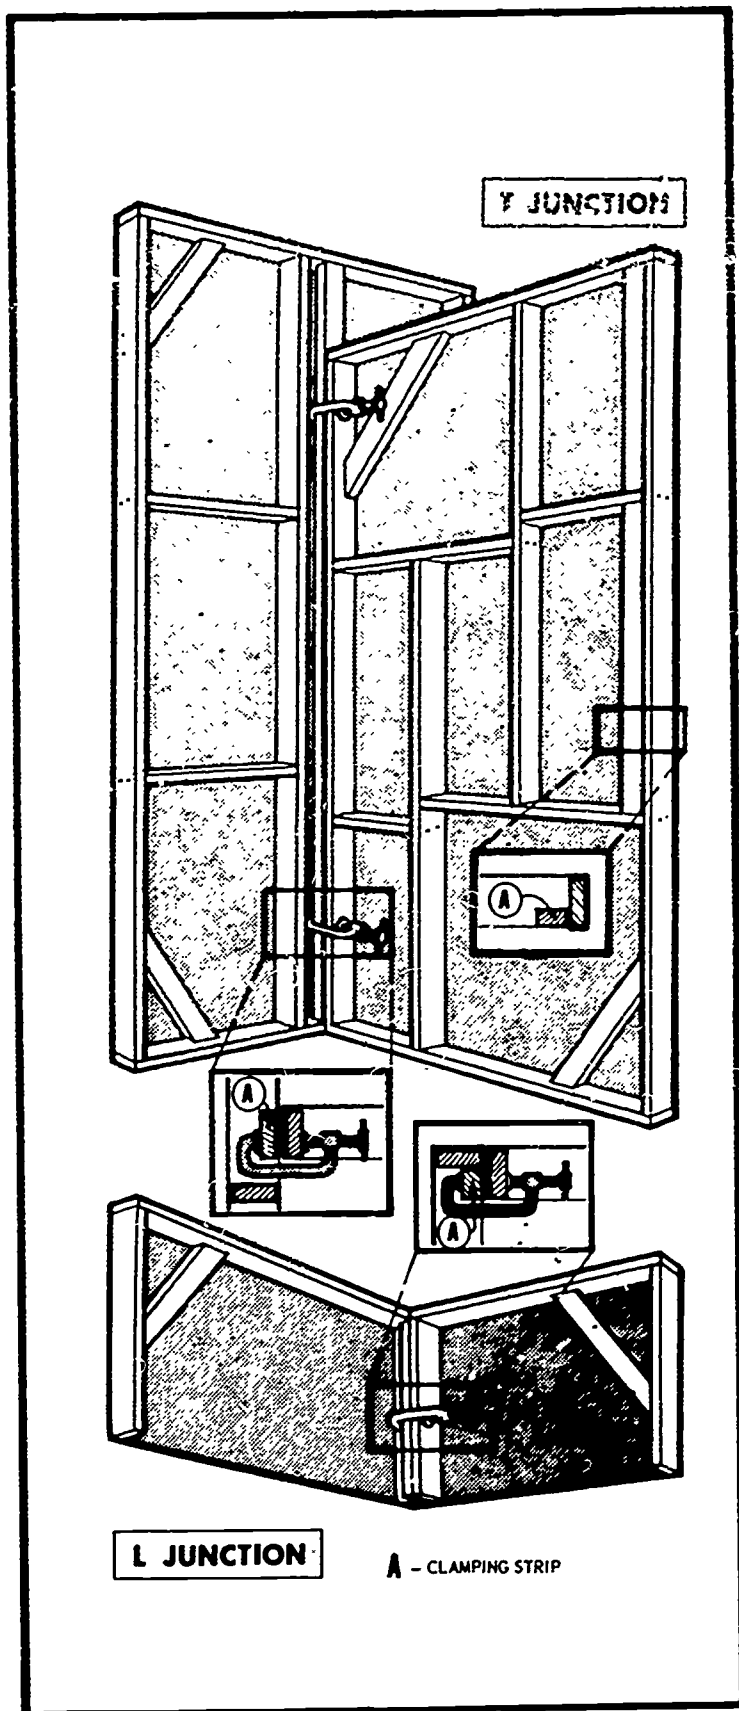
Construction details of panels to be clamped together in "L" or "T" joints.
